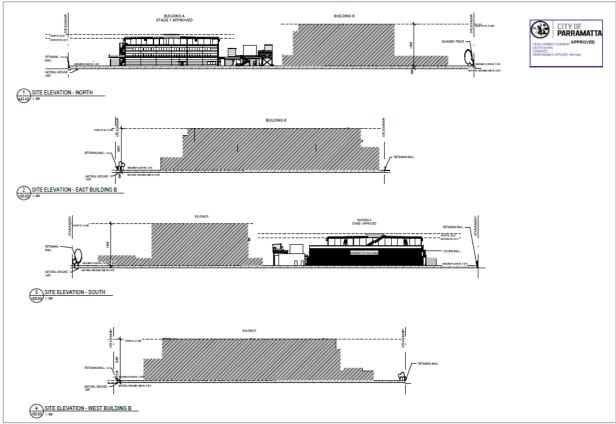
Approved Elevations with approved envelope shown hatched Source: Greenbox Architecture, stamped by City of Parramatta Council
